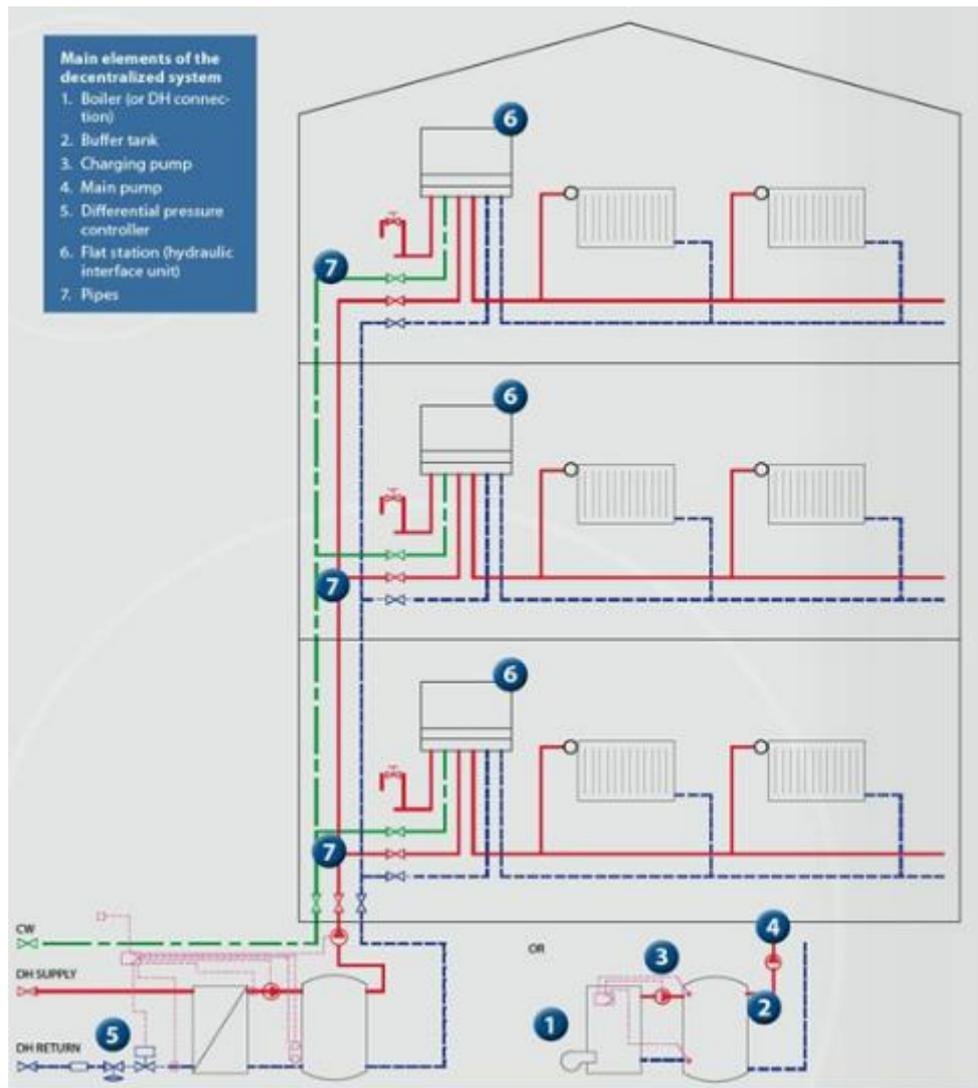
Example of district heating system connection in a high rise building (Illustration: Danfoss)
